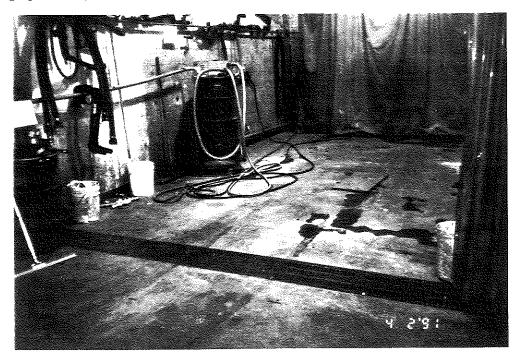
Title: Mixing Tank Drainage Pipe and Trench
